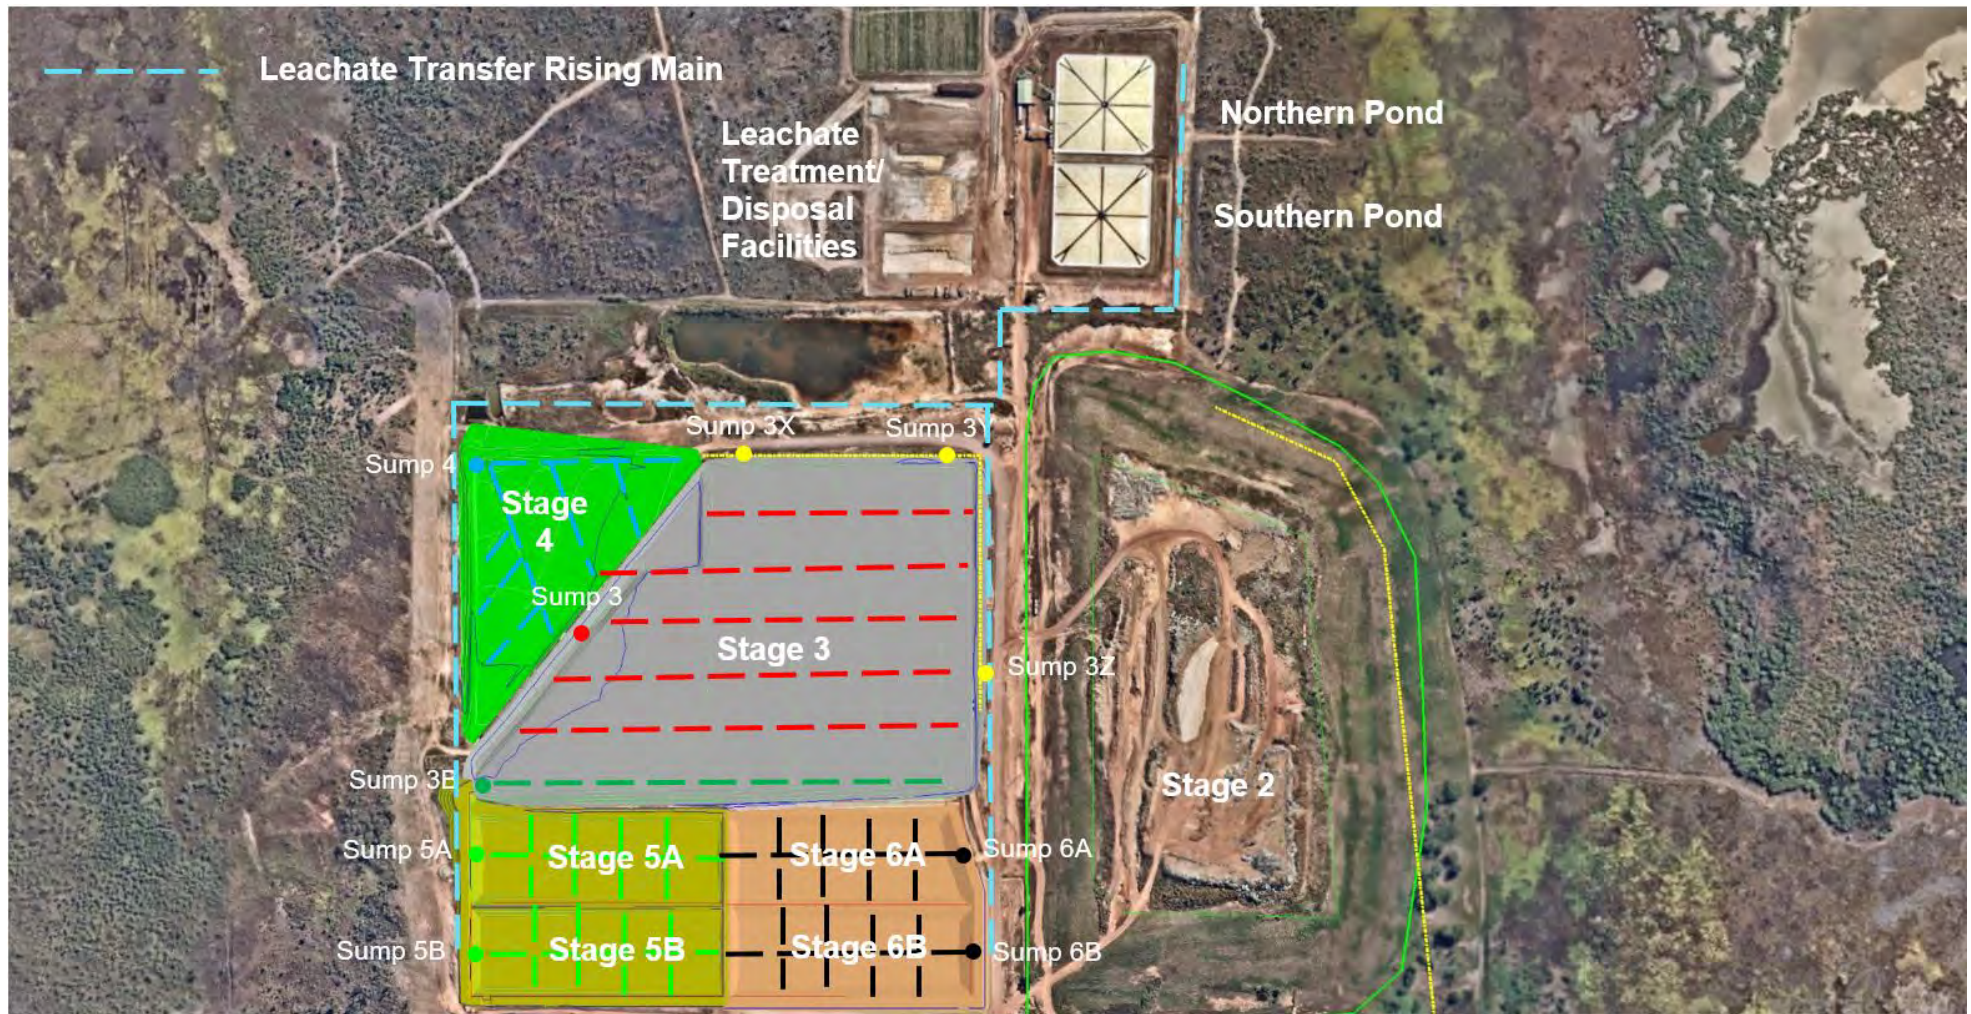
Leachate Collection Systems - SBWMF Engineered General Waste Landfill Stages
